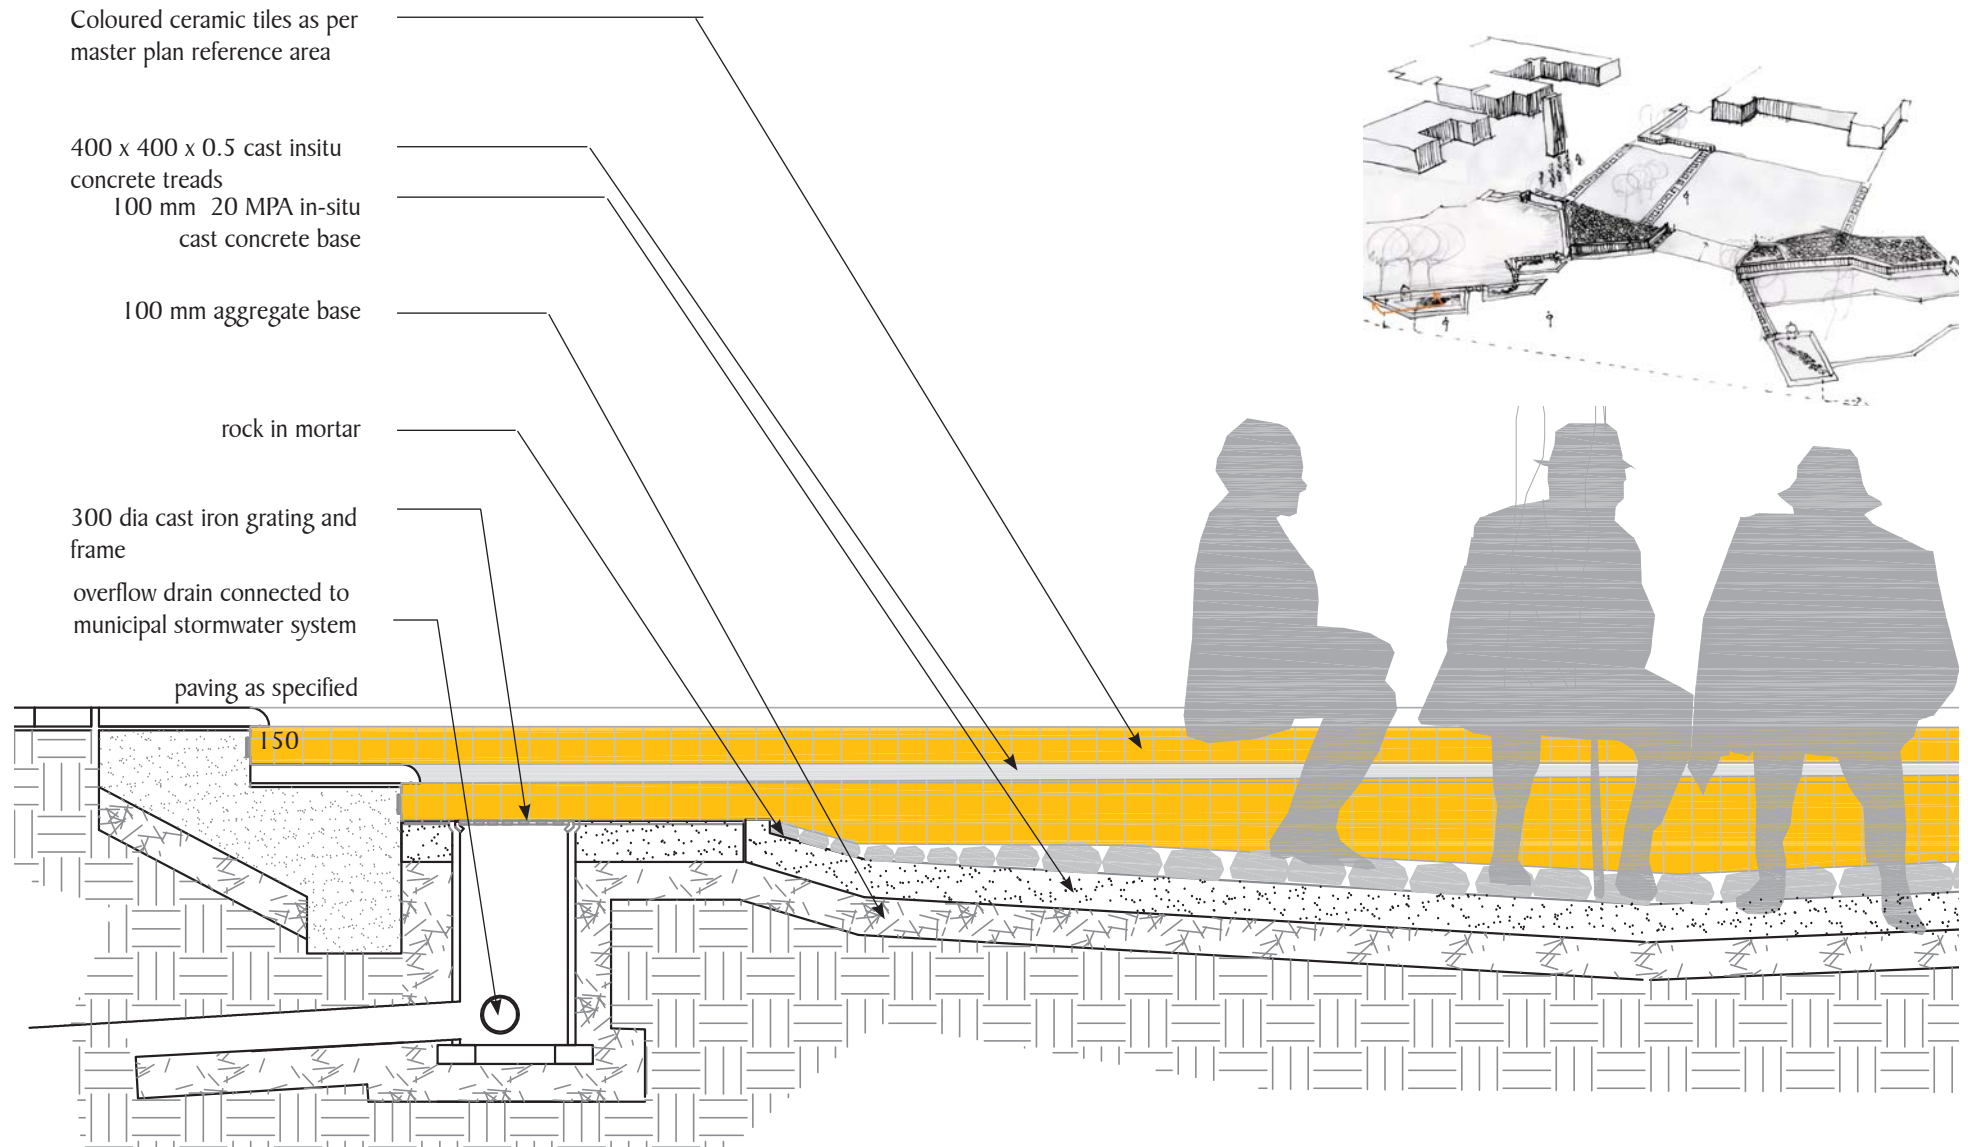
23: Sunken seating area and stormwater detention structure. (Author, 2008) Scale 1: 20
